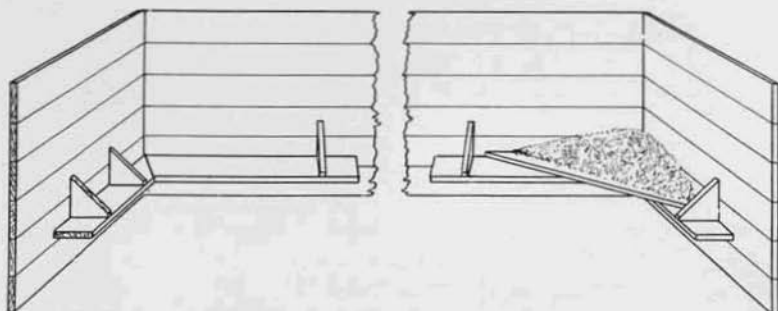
Farrowing rails are valuable. They are, as a rule, 10 inches from the floor and eight inches from the wall.
